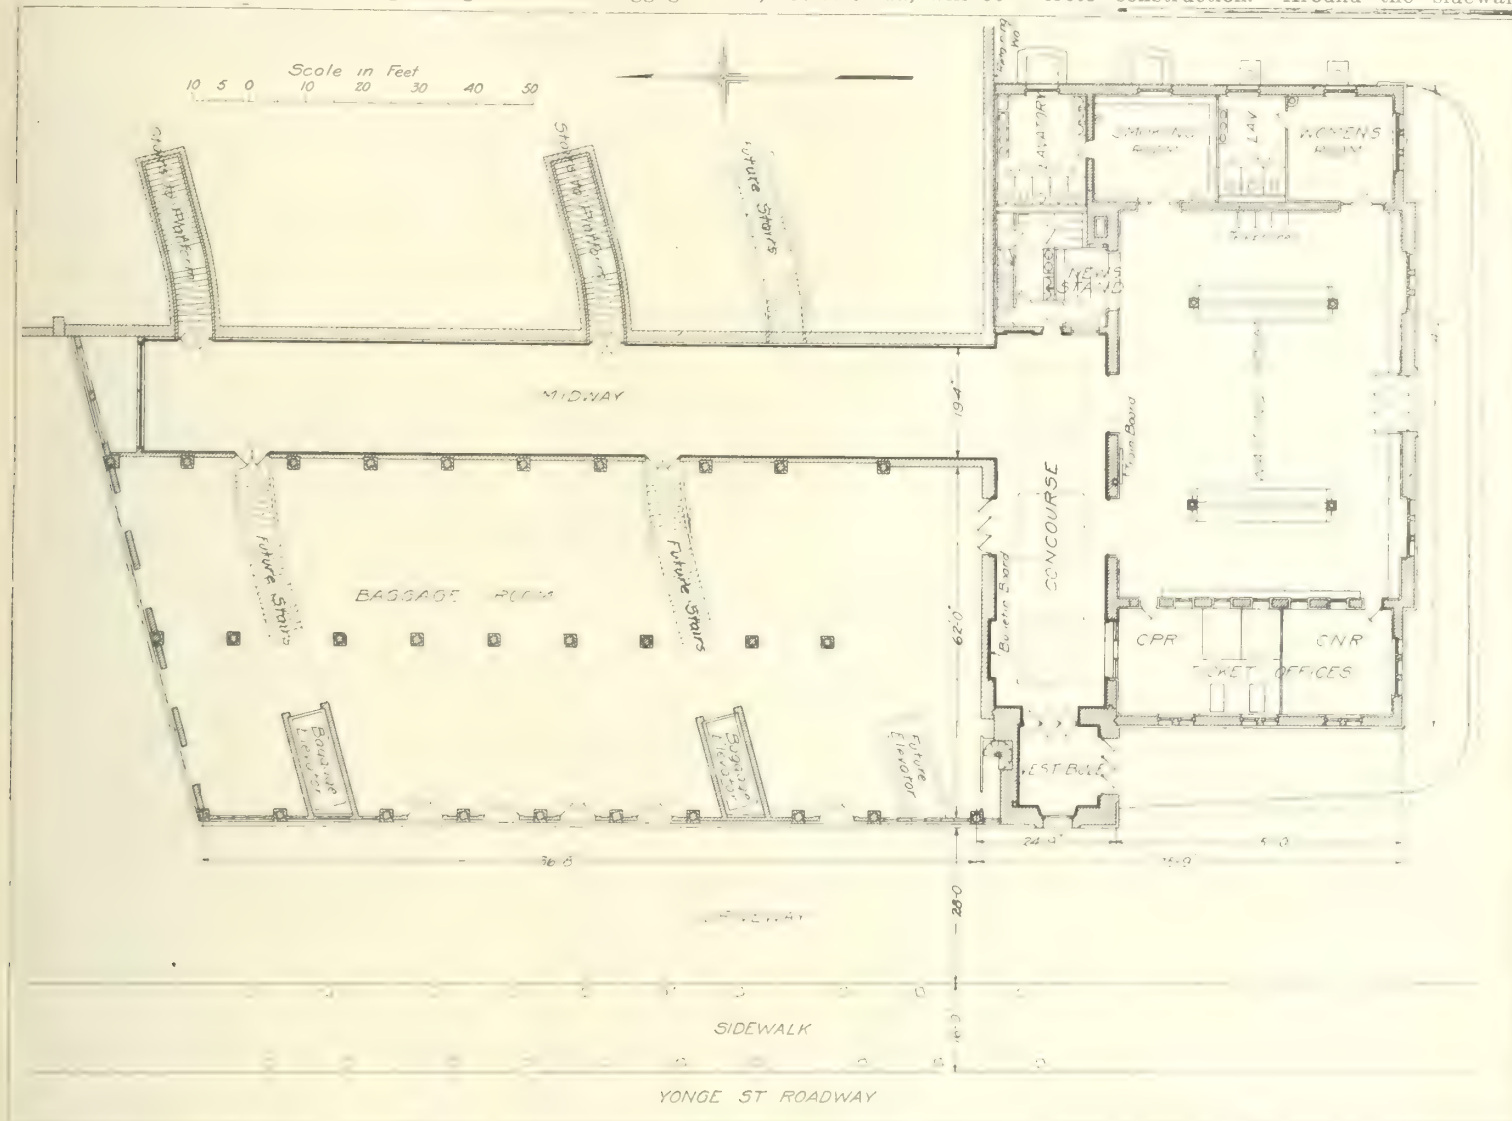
Ground Floor Plan of New North Toronto Station.
